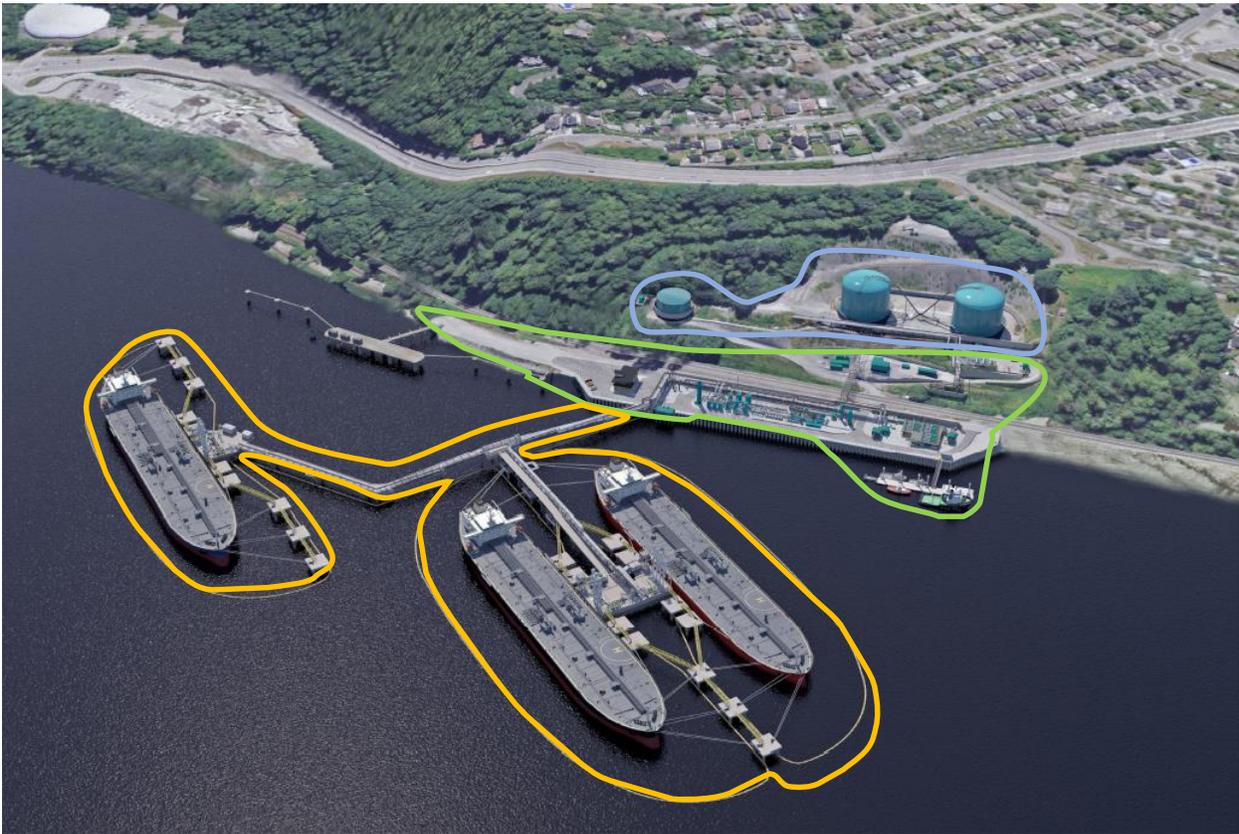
Proposed Westridge Facility (artist rendering) [3].
